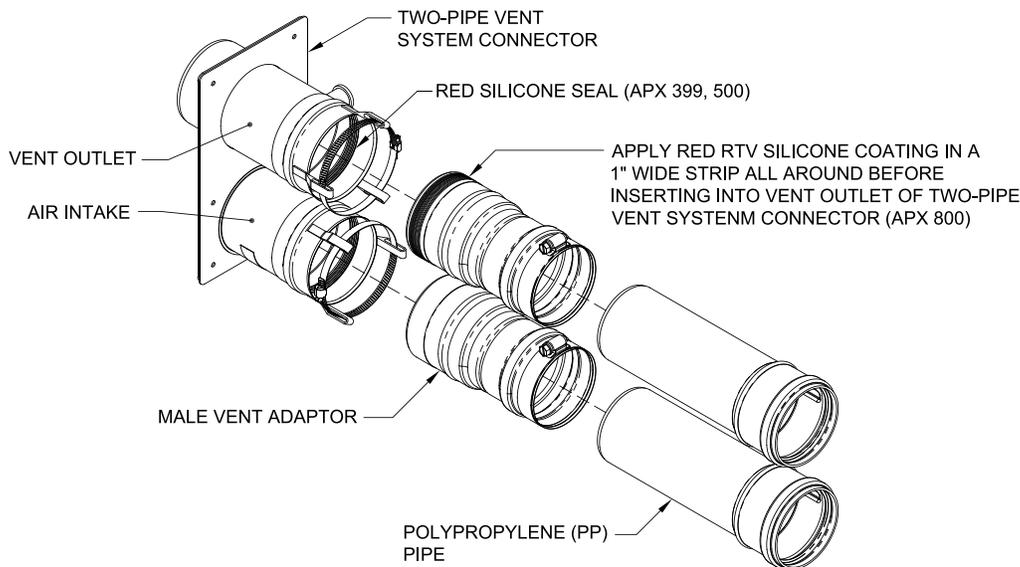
Vent System Field Modification to Install PVC to PP Adapter (M&G/DuraVent Shown)
